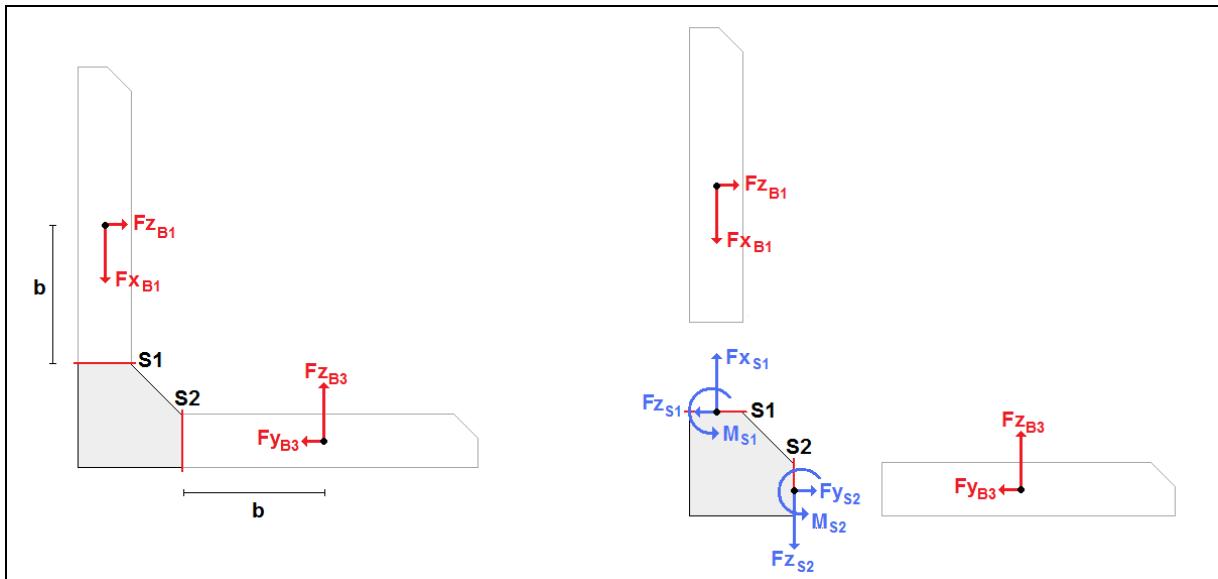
Forces in bolt layouts and corresponding forces in check sections
